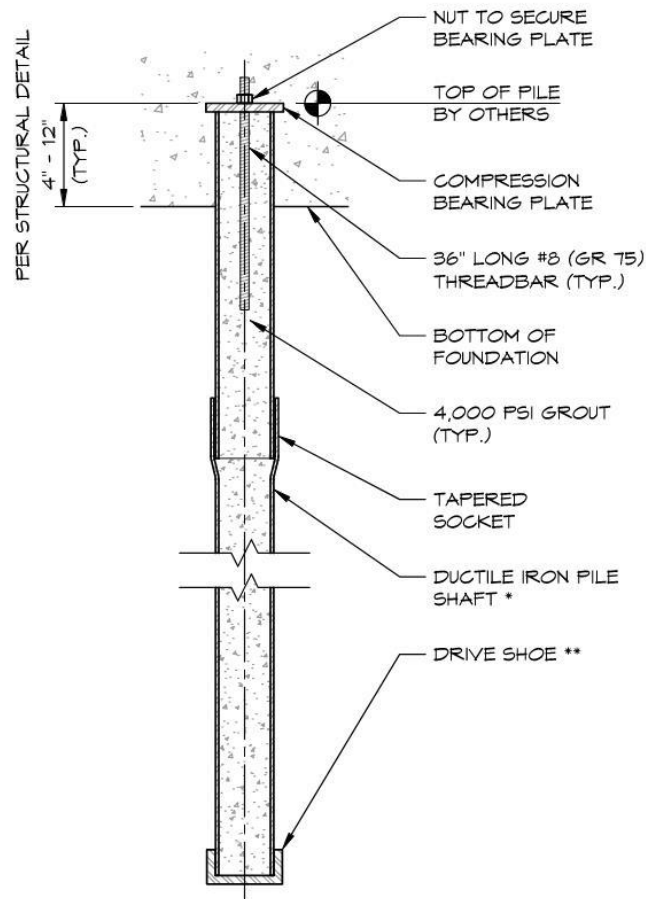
Typical Ductile Iron Pile Section for a Dry Installation (No Exterior Grouted)
